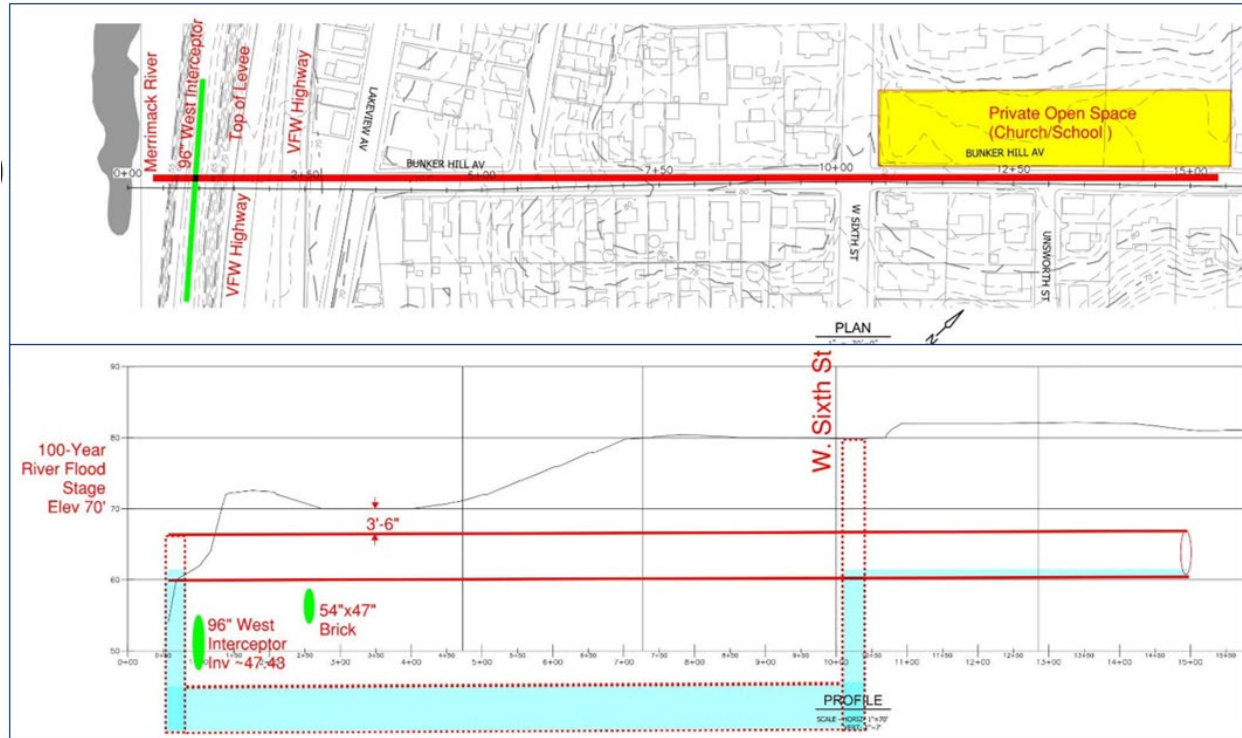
Bunker Hill Trenchless Crossing of VFW Highway
